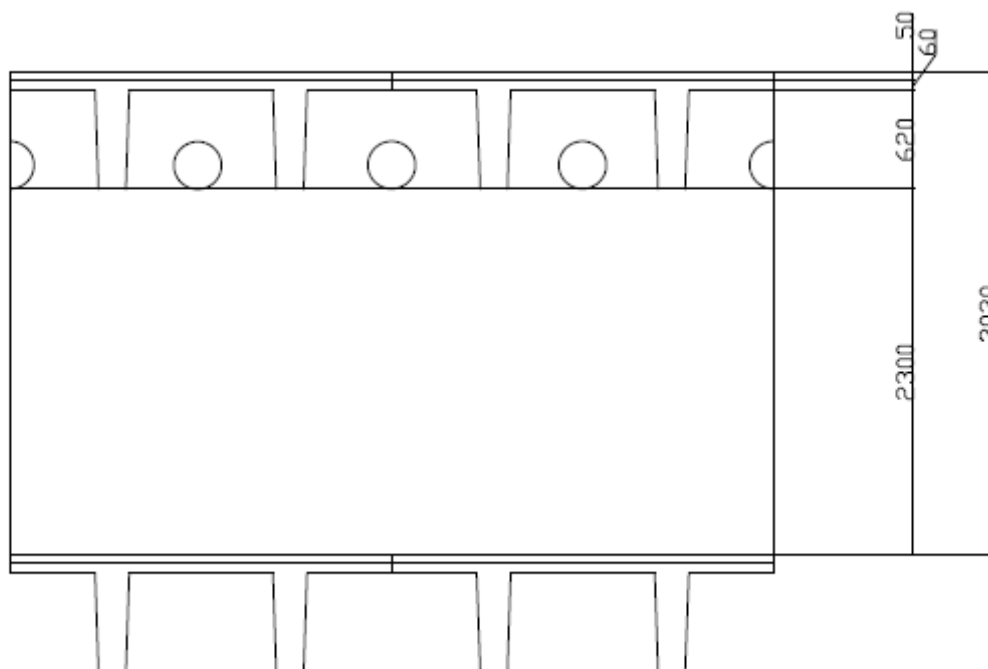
Floor-to-floor height basement Rijnhaven Tower
